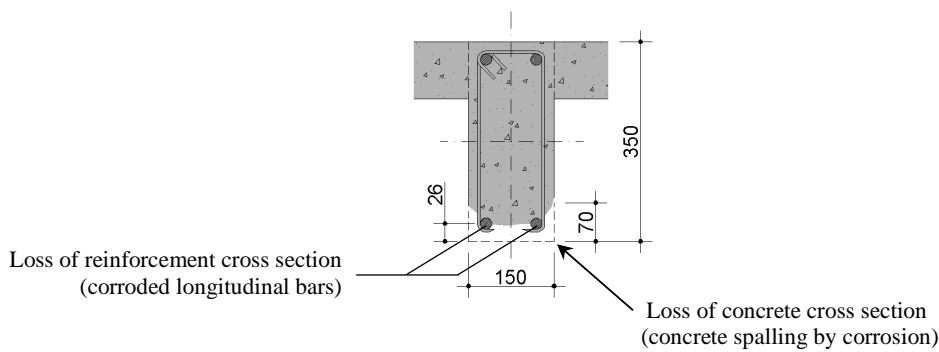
Damaged RC beam section by reinforcement corrosion
